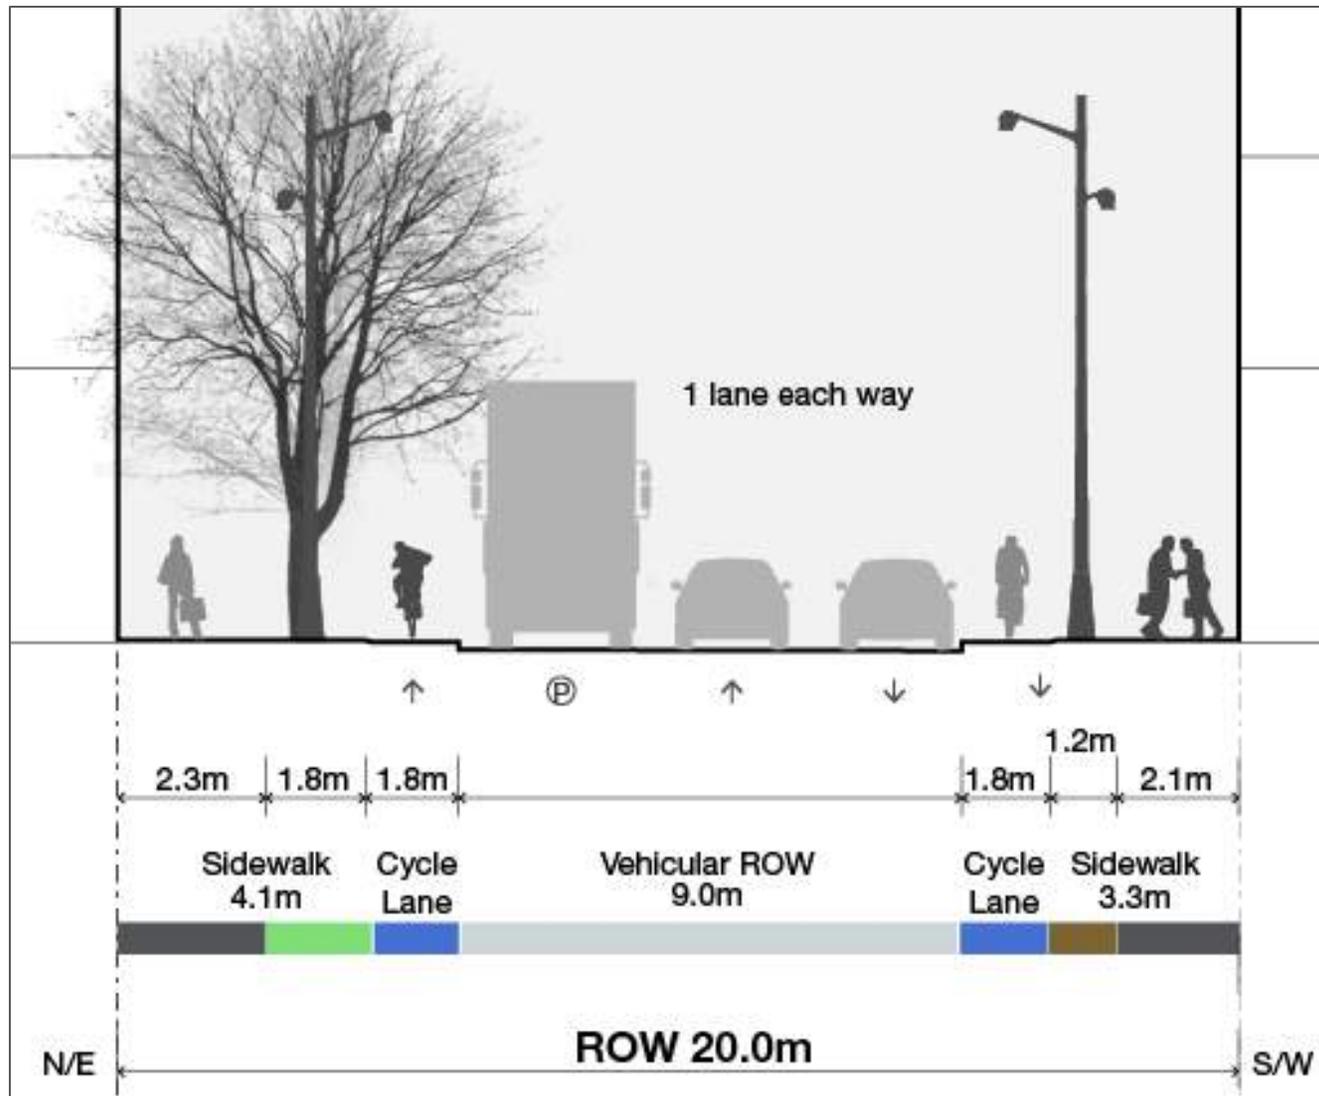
CONCEPTUAL CROSS-SECTION – NEW EAST-WEST STREETS (20 M RIGHT-OF-WAY)
